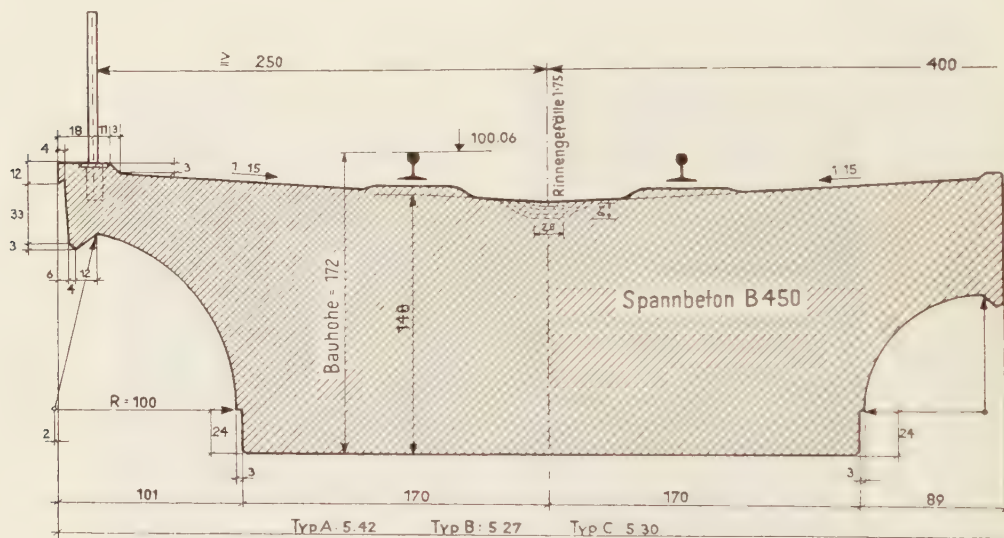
Cross section of bridge for the new Königsallee at Bochum.
